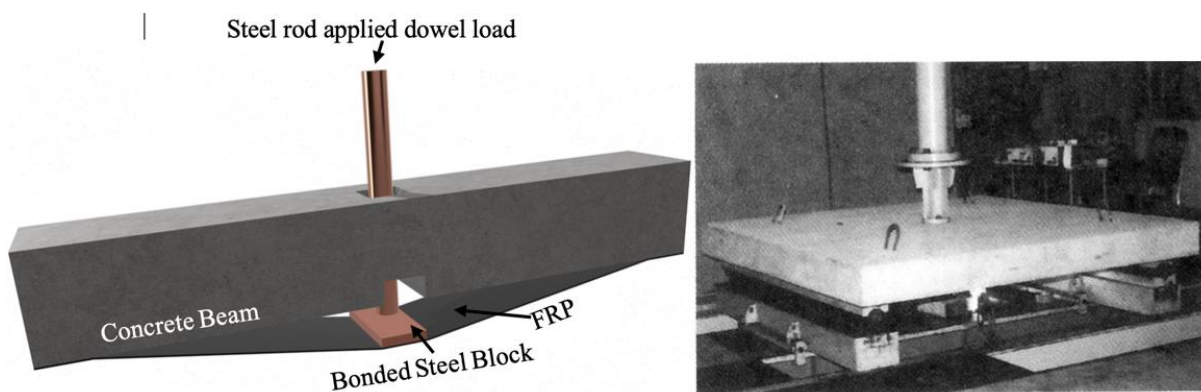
Schematic diagram of beam-type dowel test and slab-type dowel test (Wu et al., 2005a)
